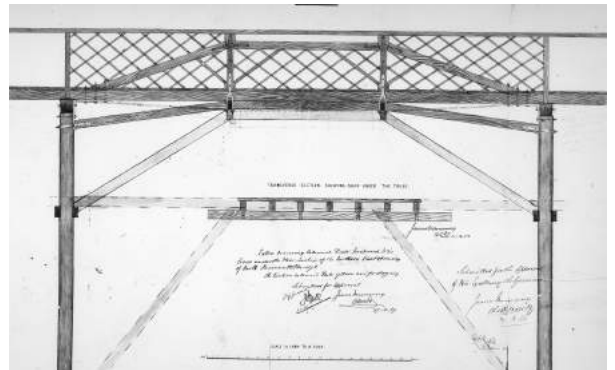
is a cross section of the bridge superstructure. The timber columns were morticed into a 350x350 mm upper cap beam which supported seven 300x130 mm longitudinal stringers. The deck consisted of 180x75 mm transverse decking planks surfaced with a layer of gravel.
